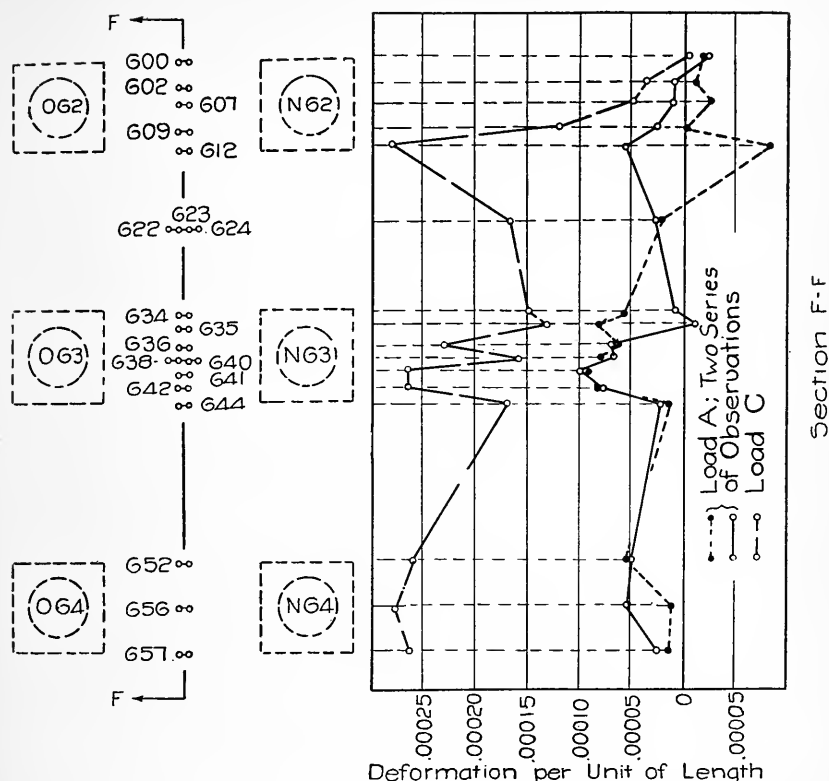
EFFECT OF CHANGE FROM LOAD A TO LOAD C ON DEFORMATION IN GAGE LINES CROSSING SECTION F-F ON BOTTOM OF 500 TERMINAL TEST FLOOR.
